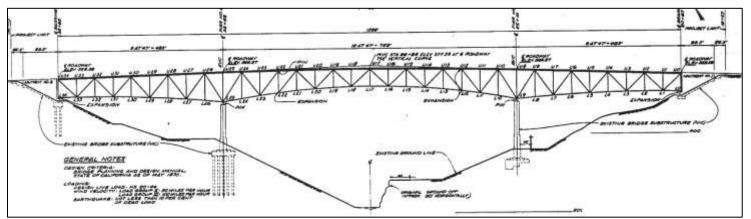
Bridge elevation from original as-built plans dated 1970.³
